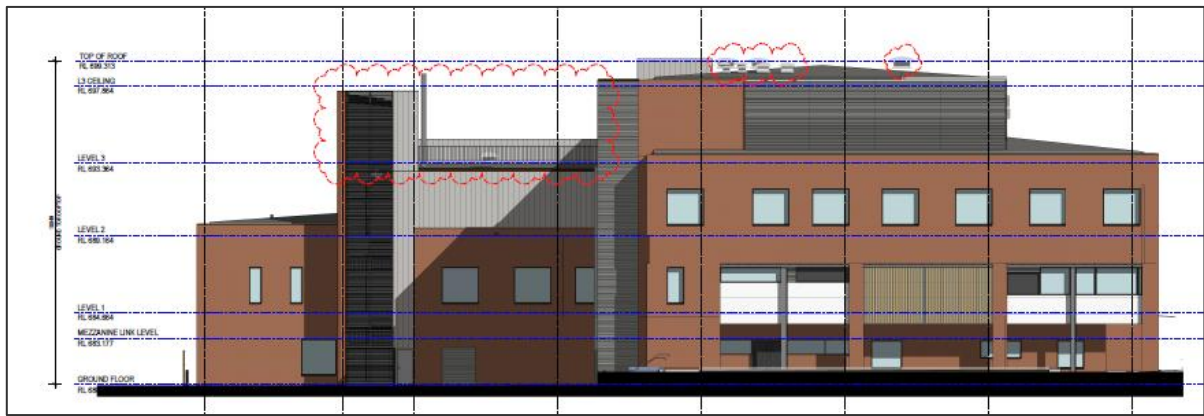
| Proposed North Elevation (SSD 8980 MOD 1)
